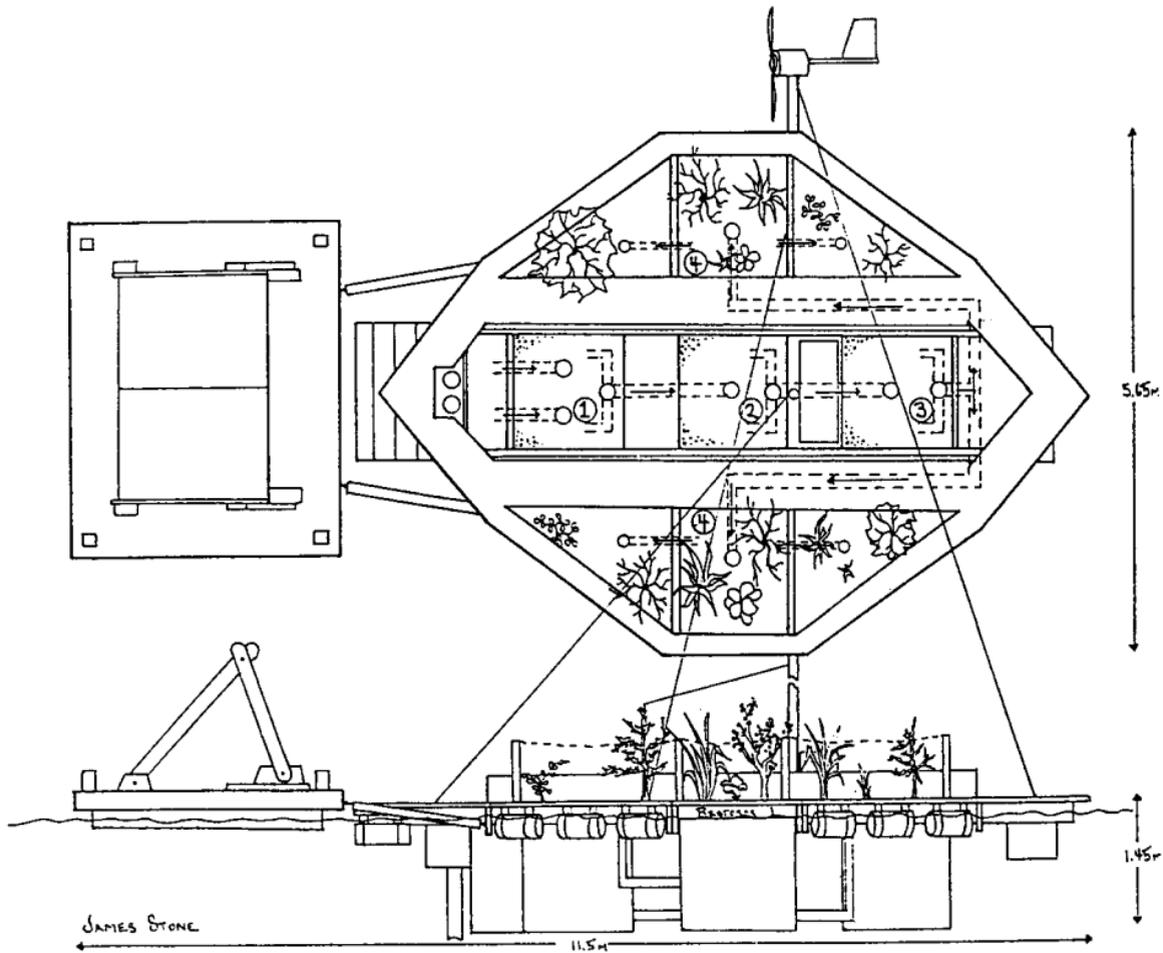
Plan and Elevation of Restorer 1 - Flax Pond, Harwich
